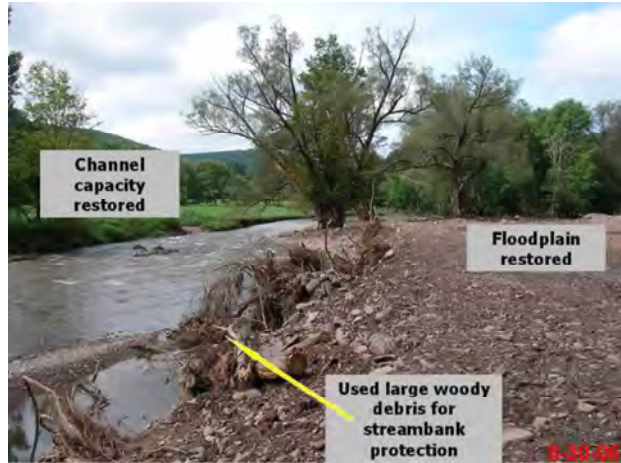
Stream construction using Regional Bank full Hydraulic Geometry values, typical cross-section and root wad.
